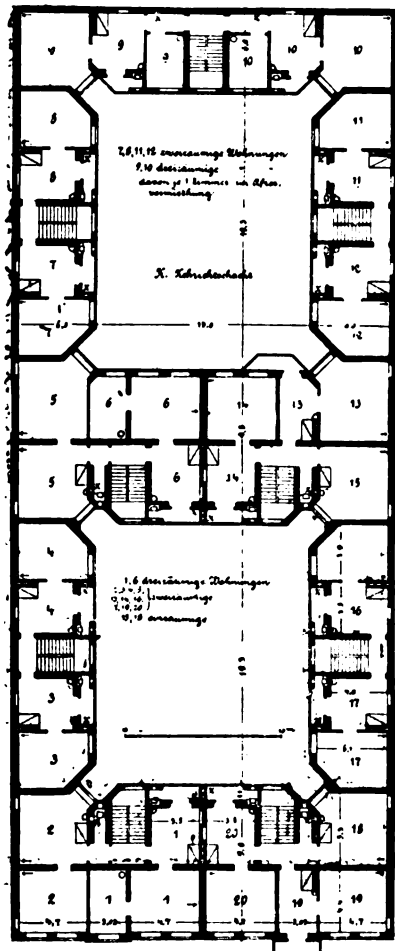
PLAN OF TENEMENT-HOUSE IN
